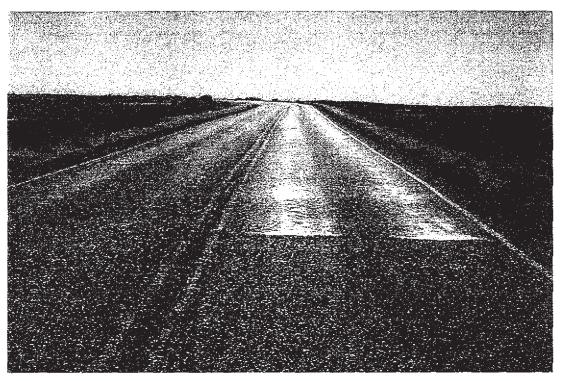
MP 11.40 Typical Pavement Section, Note Raveling and Bleeding
